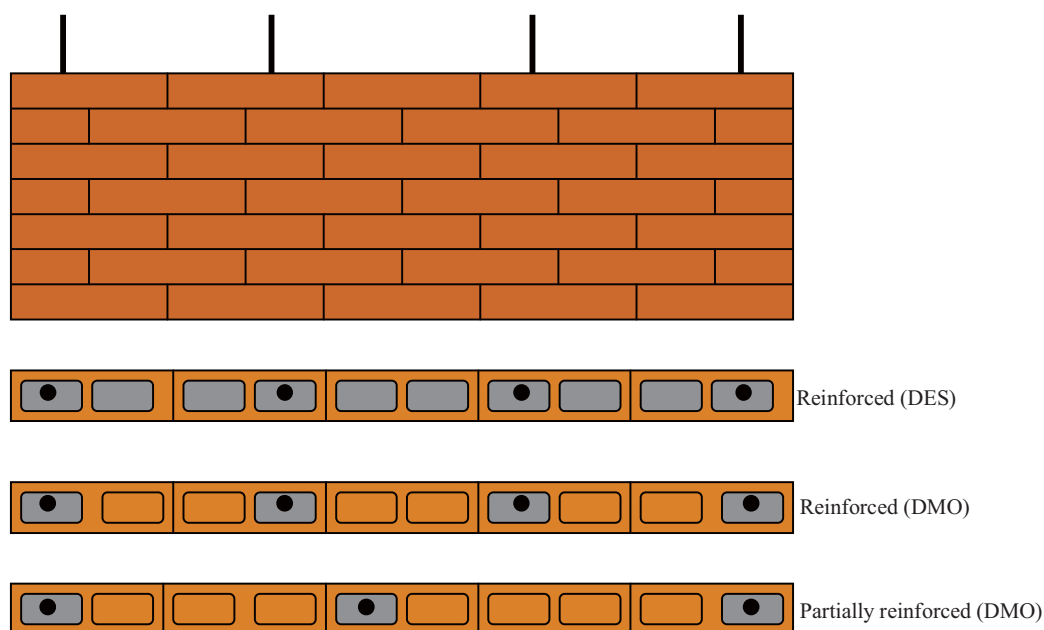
Schematic of reinforced and partially reinforced masonry walls.
